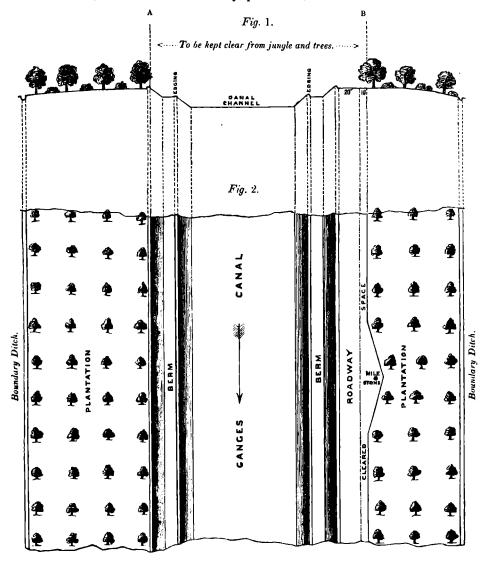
shows a section of the canal, as it is supposed to be, when the plantations are established. These plantations will, on the right bank of the canal, be established from the boundary ditch to A, or to the crest of the interior slope of the embankment. On the left bank of the canal, the plantations will be confined to the ground situated between the letter B and the canal boundary on that side.
